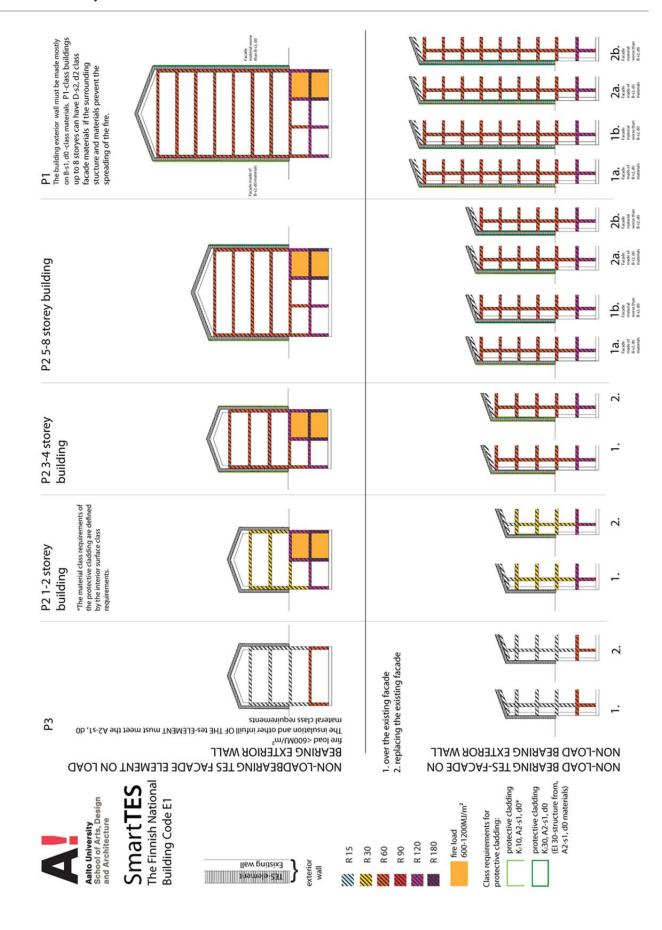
Fire safety requirements Finland – Non load bearing TES facade on load bearing and non-load bearing exterior wall.
